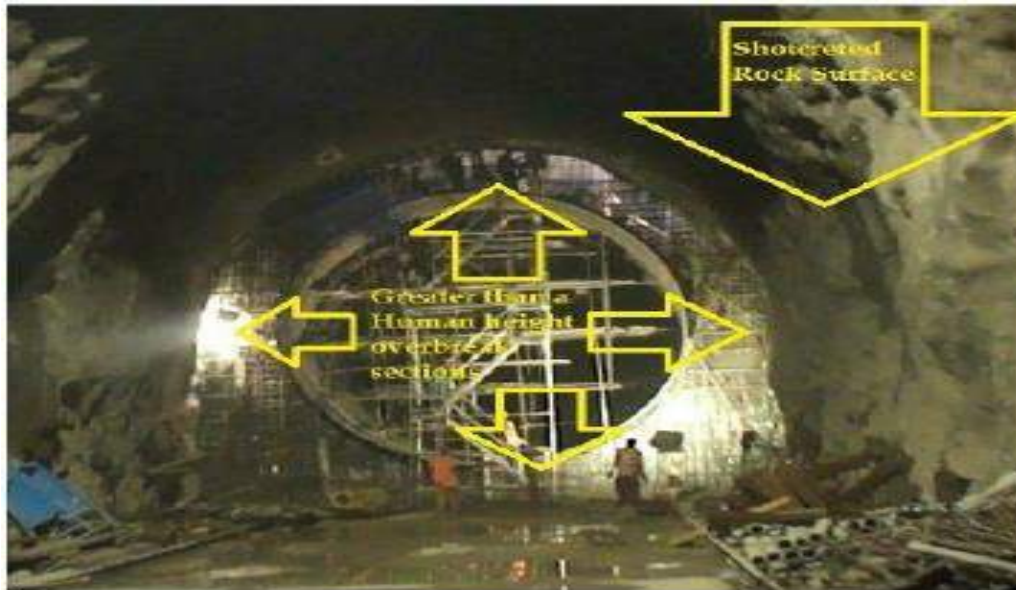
Typical over break sections and steel lining in the power tunnels This is a lack of controlled blasting knowledge and it, therefore, leads to uncontrolled cost overrun.
